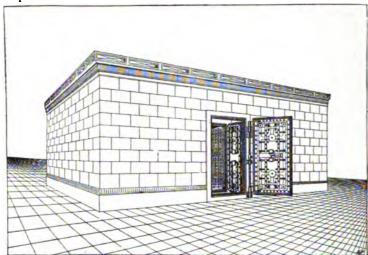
Safe-deposit and bank vanit. Elevation.
